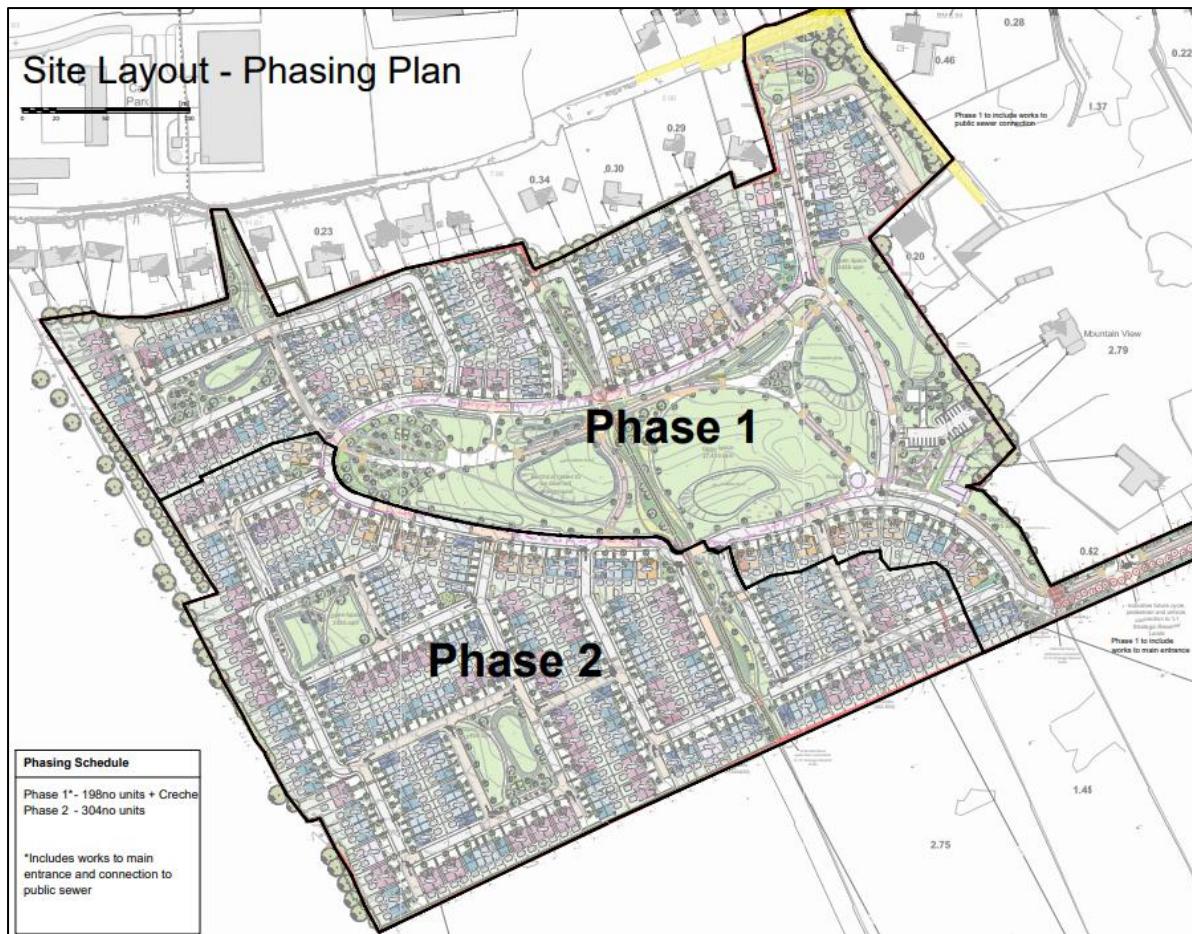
Phasing Plan (Extract from JFA, Drawing Pack, Drg. No. P1016)
